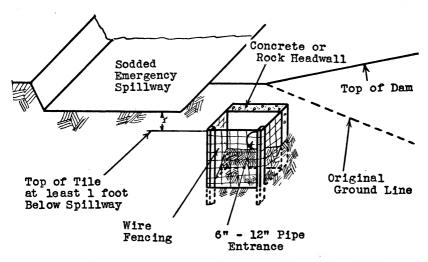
Relation of tile inlet to sodded spillway, and details of inlet construction.
